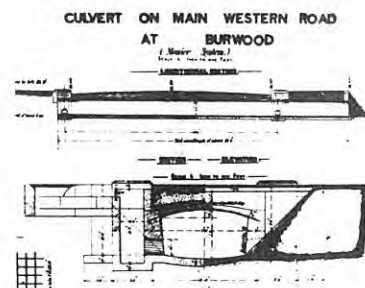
A modest stormwater culvert constructed in 1894 under Parramatta Road, Burwood, using the Monier System began reinforced concrete in New South Wales.
